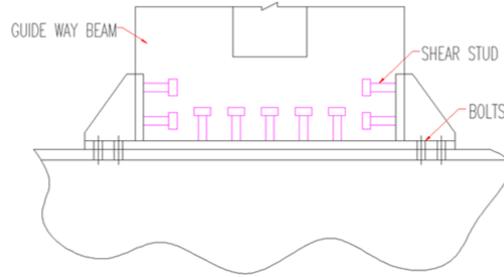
Torsional resistant connection of Guideway beams with cross girder
